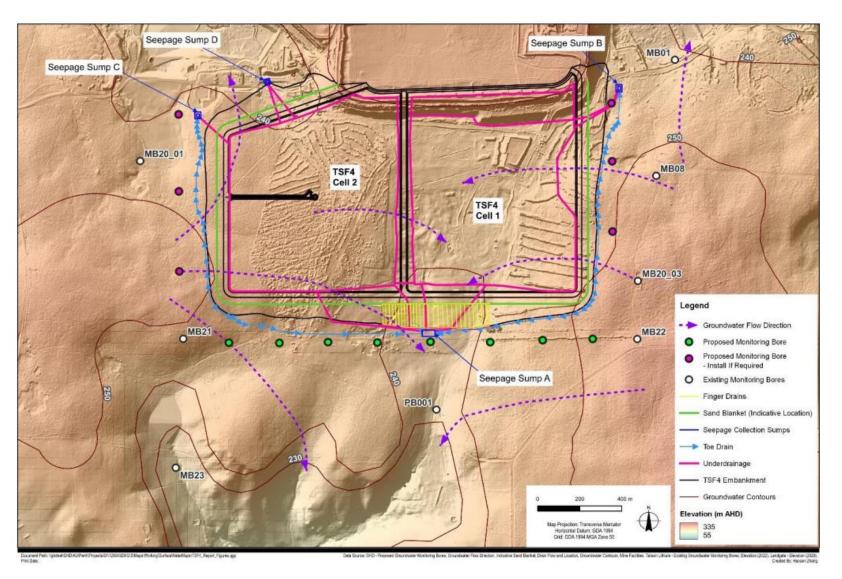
Location plan of existing (white) and proposed (green) groundwater monitoring bores. Locations in pink are those proposed for installation at a later time if required.
